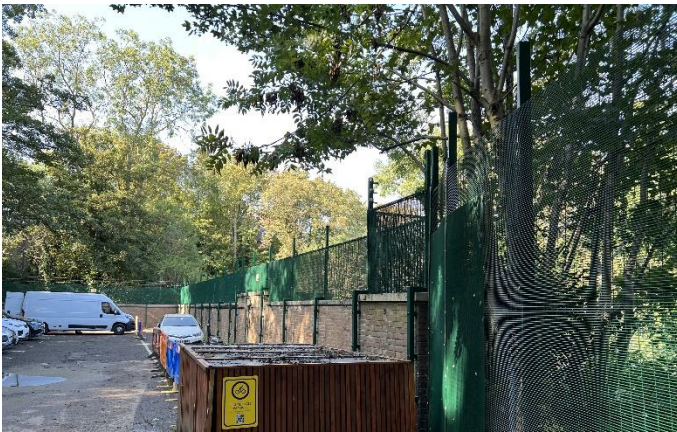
Final section of fencing complete, adjoining the 'purple' and 'orange' sections.
